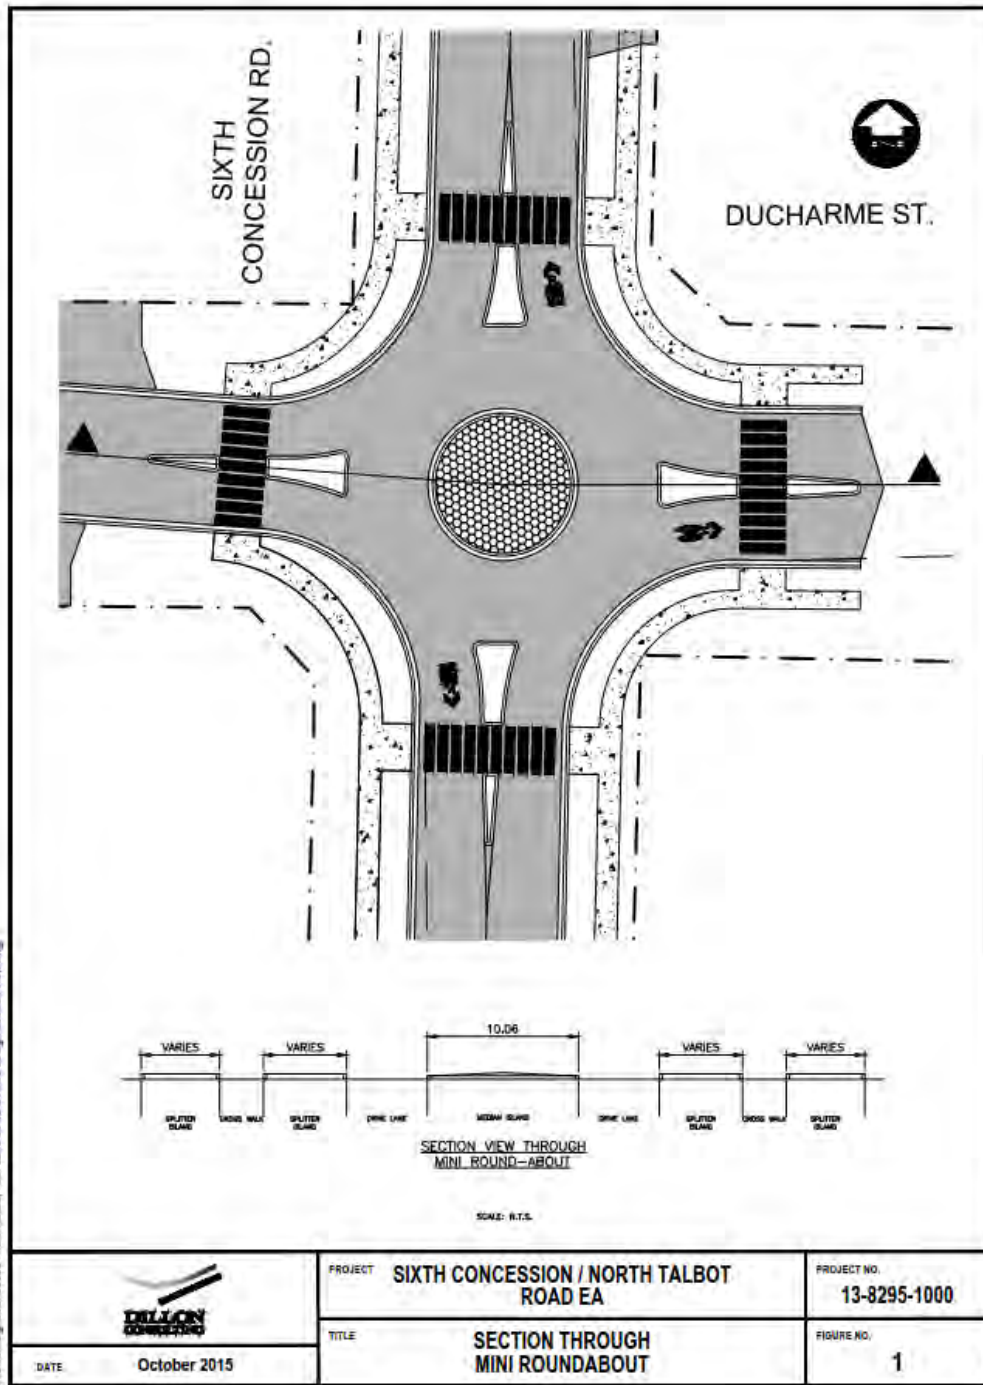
TYPICAL MINI ROUNDABOUT PLAN AND CROSS SECTION
